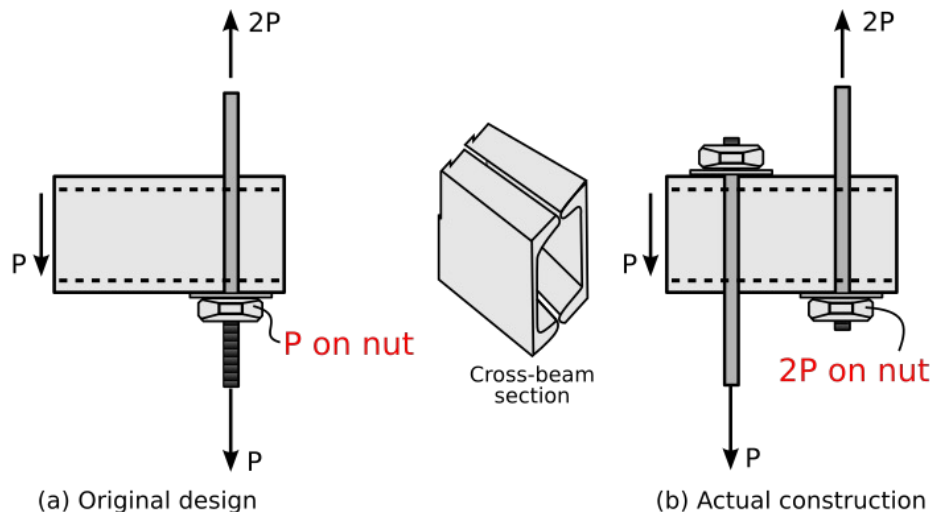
Cross beam design of the collapsed fourth-floor elevated walkway in the Hyatt Regency Hotel, USA. (a) Original connection design, (b) Modified design that led to the failure
